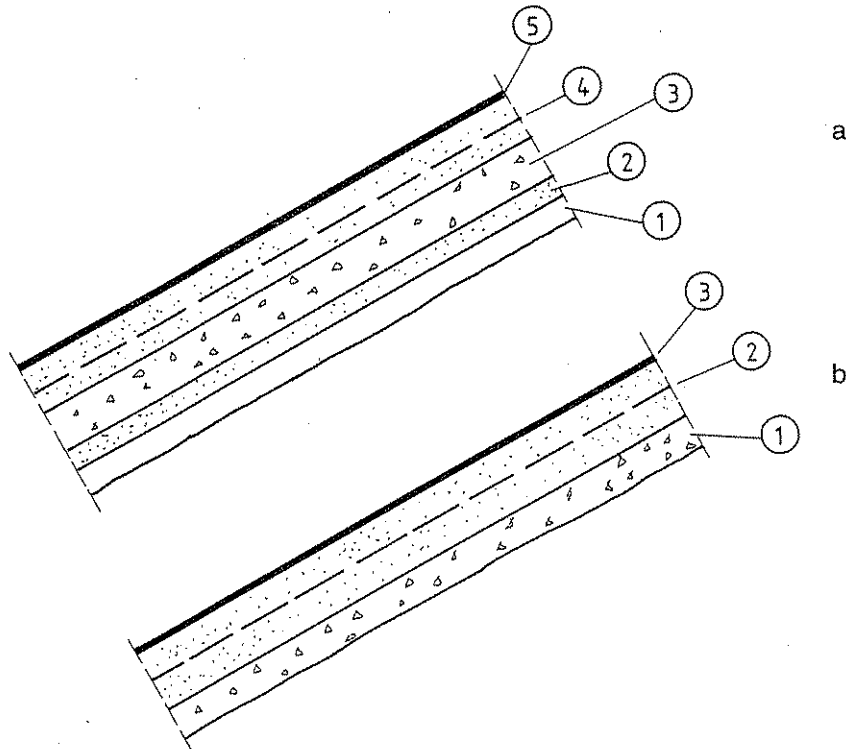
Face sealings of asphaltic concrete, typical design.
